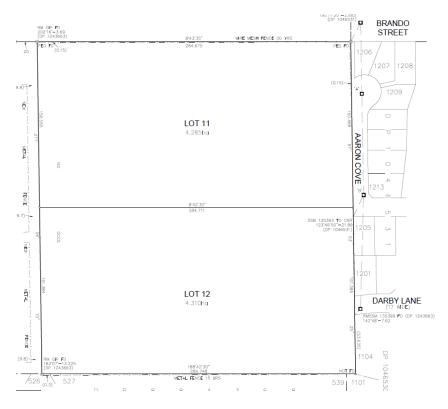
Proposed Subdivision Layout noting Aaron Cove is the northern boundary of the site (Source: Rennie Golledge)
